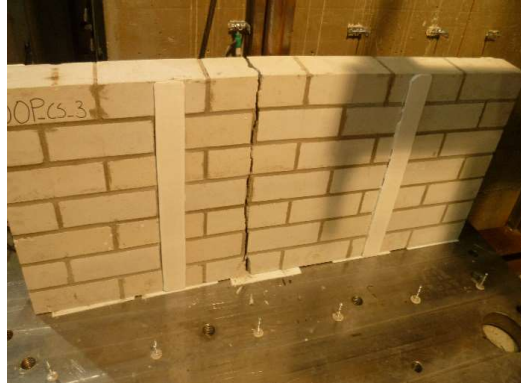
46: Line failure observed for CS masonry wallettes tested for flexural strength in the laboratory.
